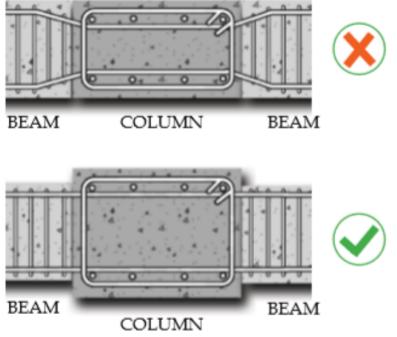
Reinforcement pattern on beam column joints (credit: TESRA ppt)
